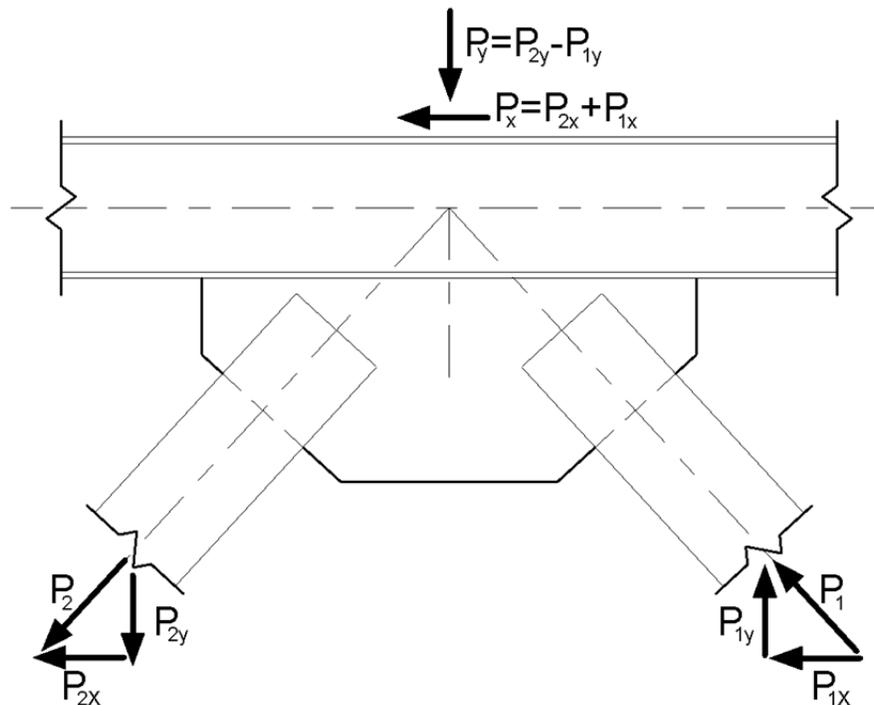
Unbalanced Load Due to Inverted-V Brace Layout
